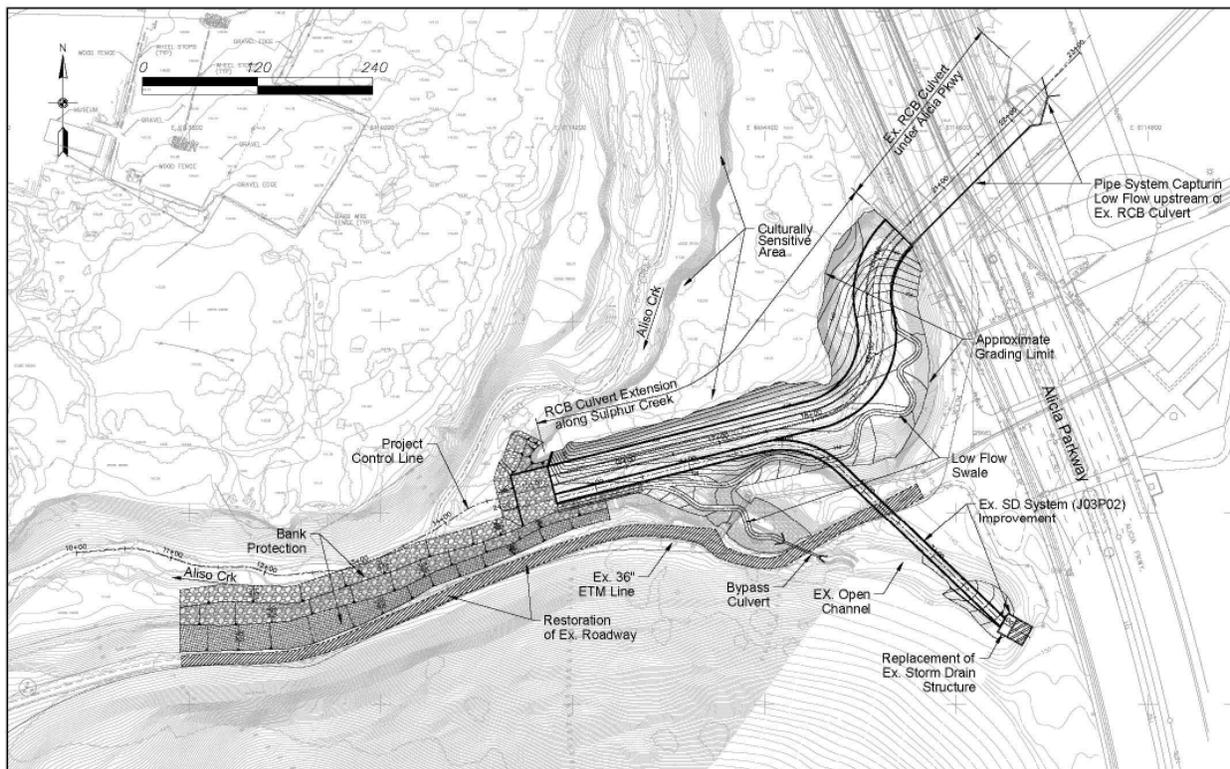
Overall Layout of Proposed Improvements for 35% Level Design
